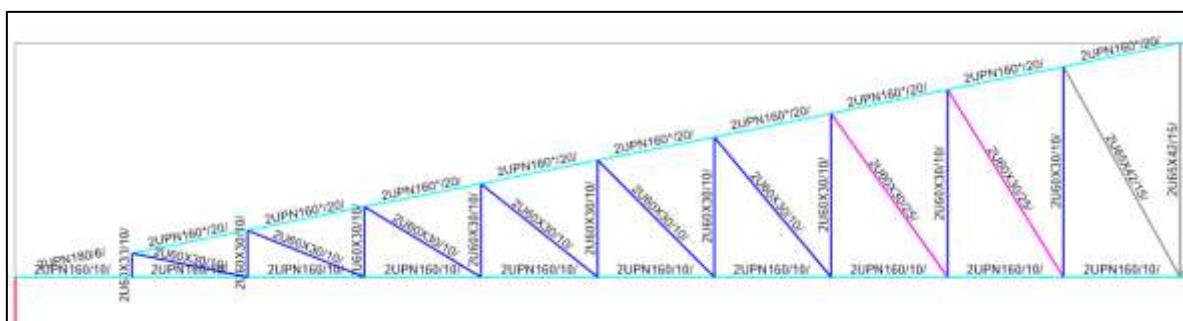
Portion of sections of truss (type 1 and spanning 30m)
